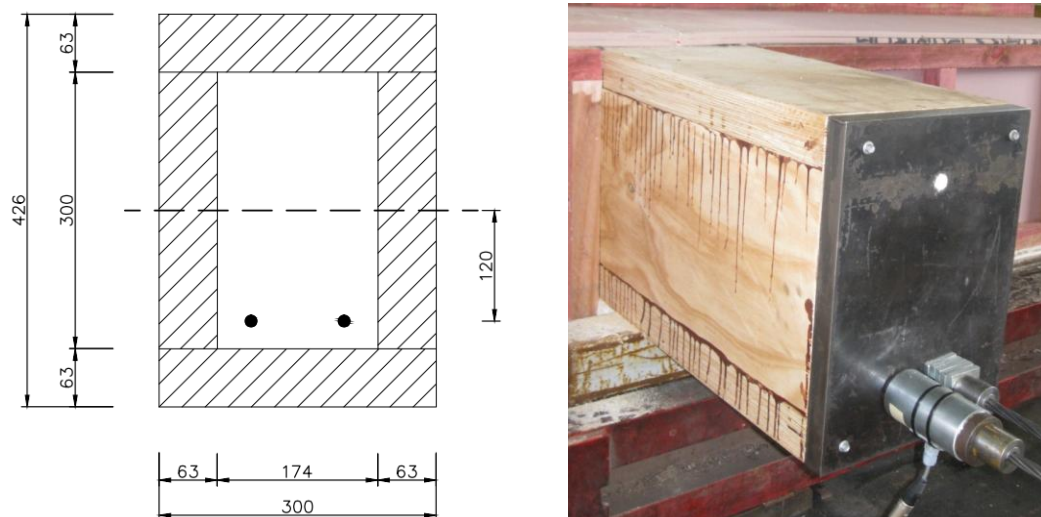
Beam A – LVL cross section (left). Photo of completed beam showing post-tensioning anchorage (right)
